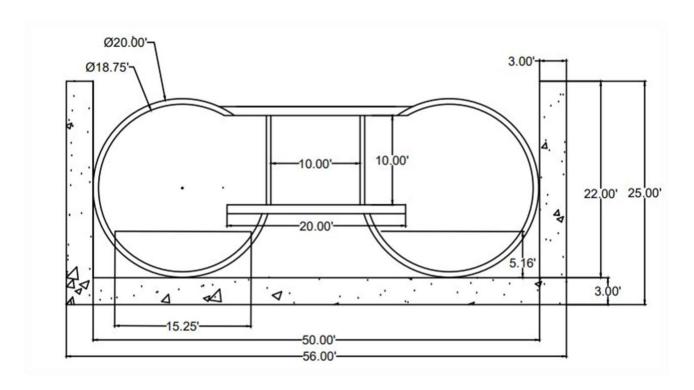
Cross section view of concrete diaphragm wall with two 20' diameter tunnels.
